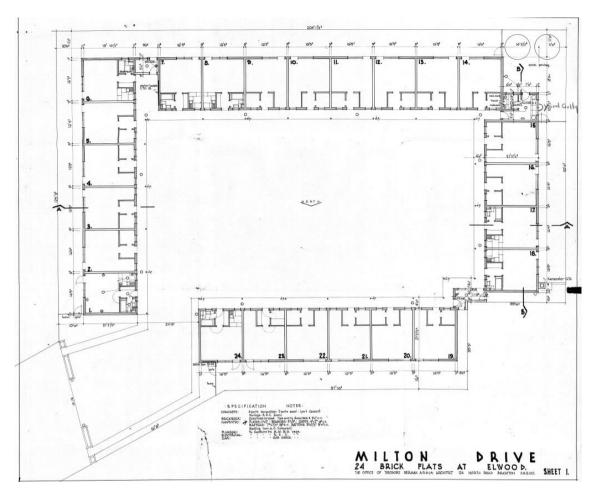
Original layout plan (Source: City of Port Phillip Building Archives)
